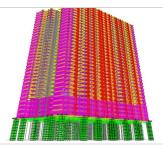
3D modelled of Building with pile raft foundation in SAP2000
